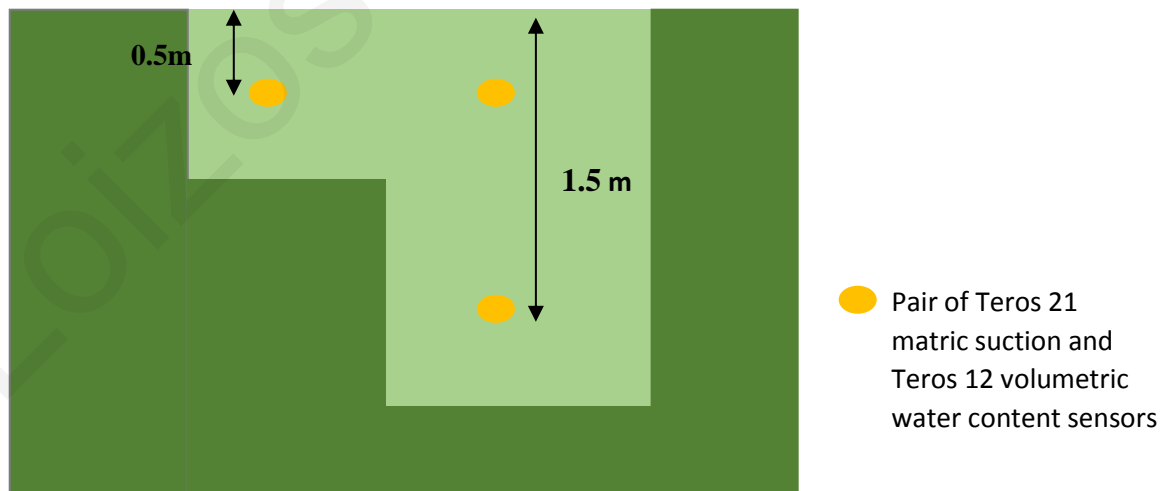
Front view of the excavation (test pit 1) side wall showing arrangement of ground sensors.
